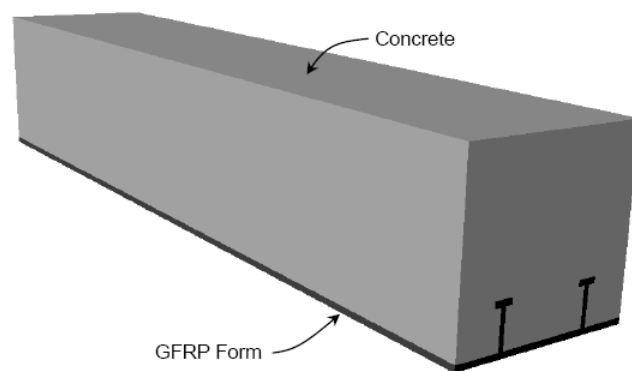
Concrete and GFRP ribbed sheet hybrid section (Hall et al., 1998)
